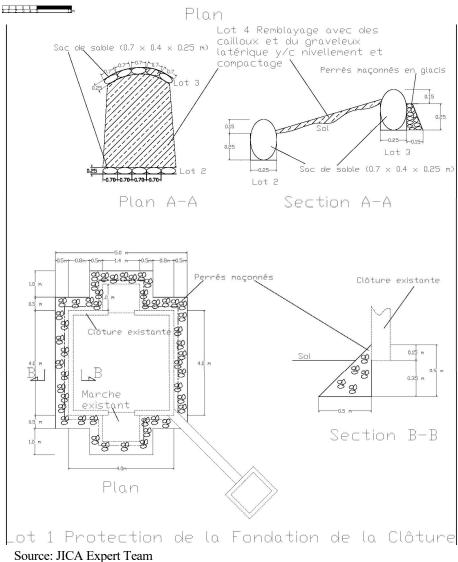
Plan and Section of the Rainwater Protection at Dedegbeu Village
